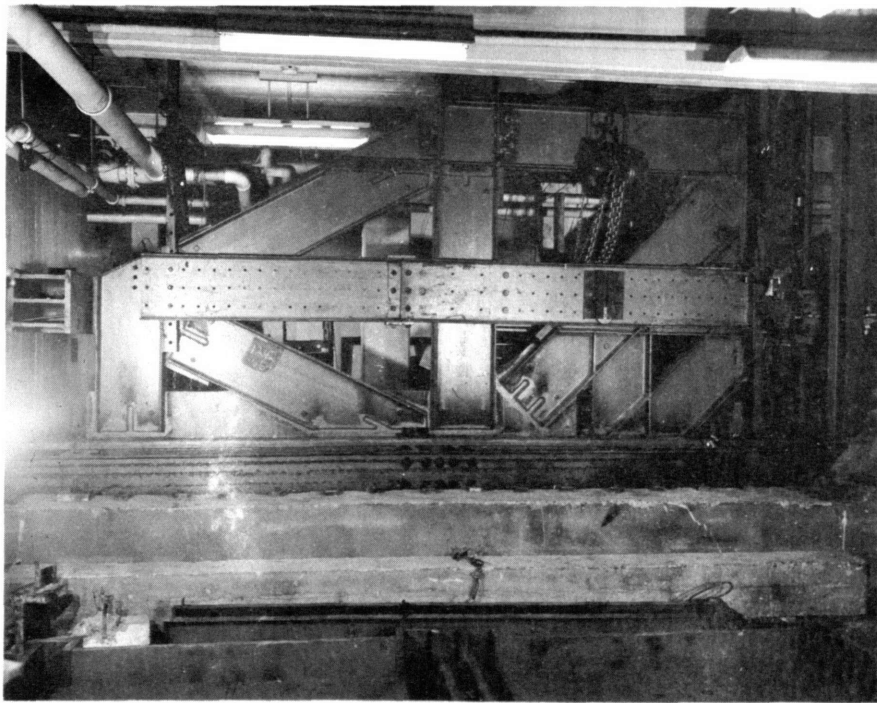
Side View of Heavy Truss and Lateral Foundation Beam
